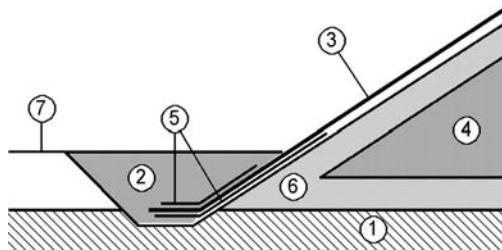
Anchoring of the slope in the dam's toe. (1) Water-impermeable foundation; (2) compacted earthfill; (3) geomembrane; (4) the dam's body; (5) geotextile; (6) drainage layer (base layer); (7) ground line.
